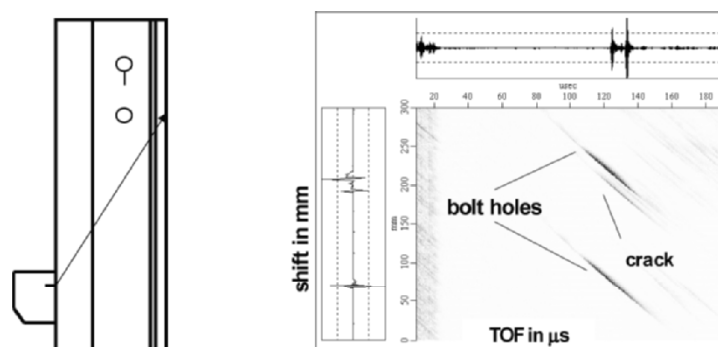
Imaging of a bolt hole crack in a rail by angle beam.
